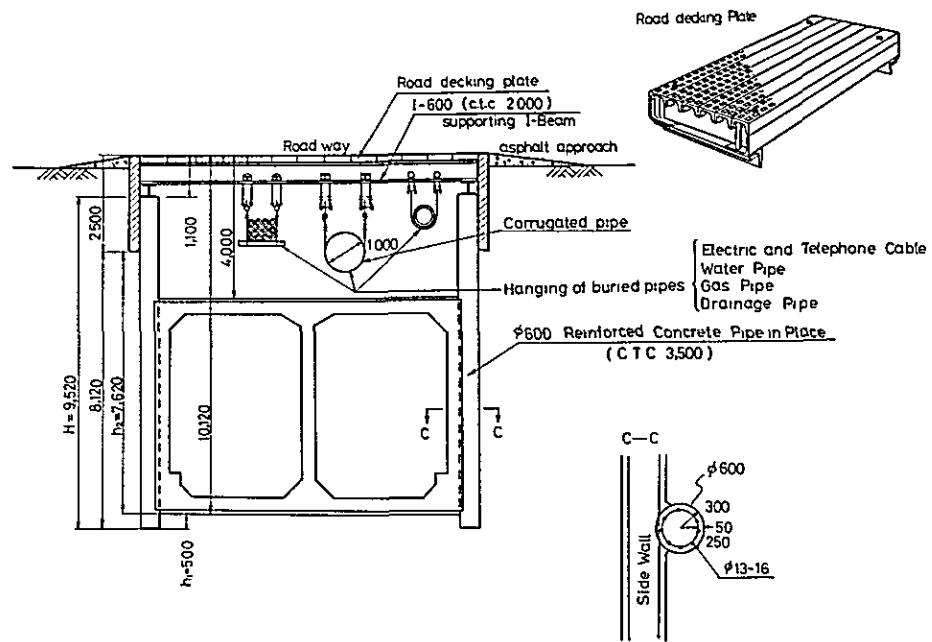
Cut and cover method with surface planking and handling of buried pipes
